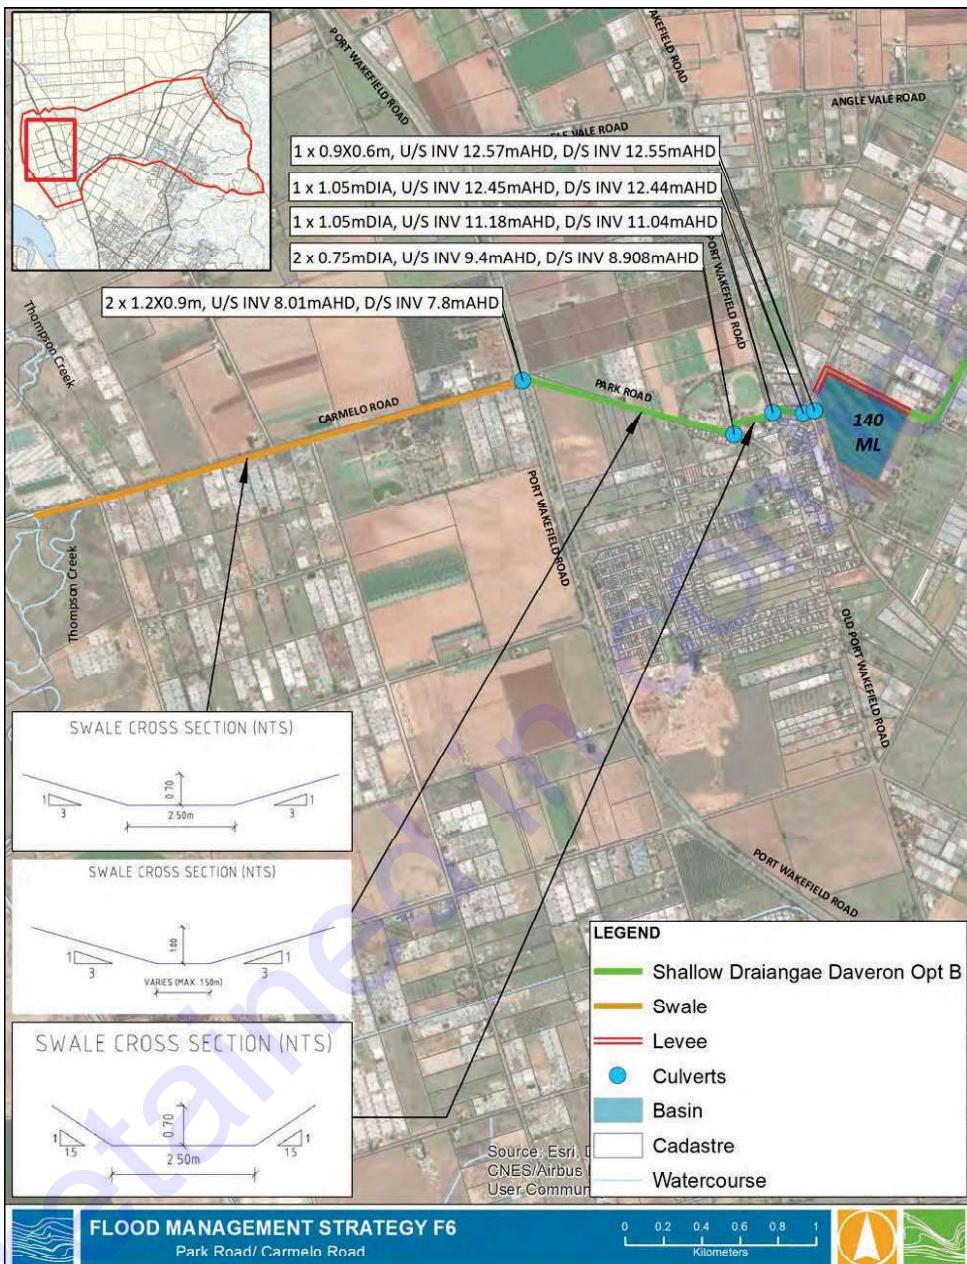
STRATEGY F6 - PARK ROAD / CARMELO ROAD DRAINAGE UPGRADE AND ANGLE VALE RD TO RAILWAY BASIN – SHEET 1
